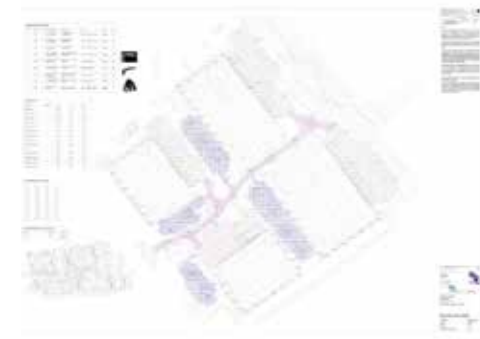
Design and Access Statement - Illustrative Lighting Plan
